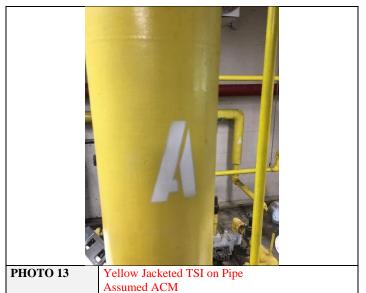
Yellow Jacketed TSI on Pipe Assumed ACM
